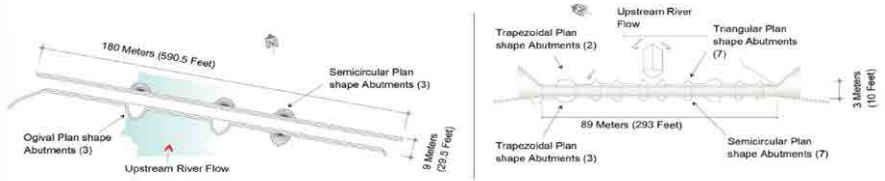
Left, plan of Las Donadas Bridge, Montoro Spain. Source (Author 2020) Right, Plan of Los Esclavos Bridge, Santa Rosa, Guatemala. Source (Author 2020)
